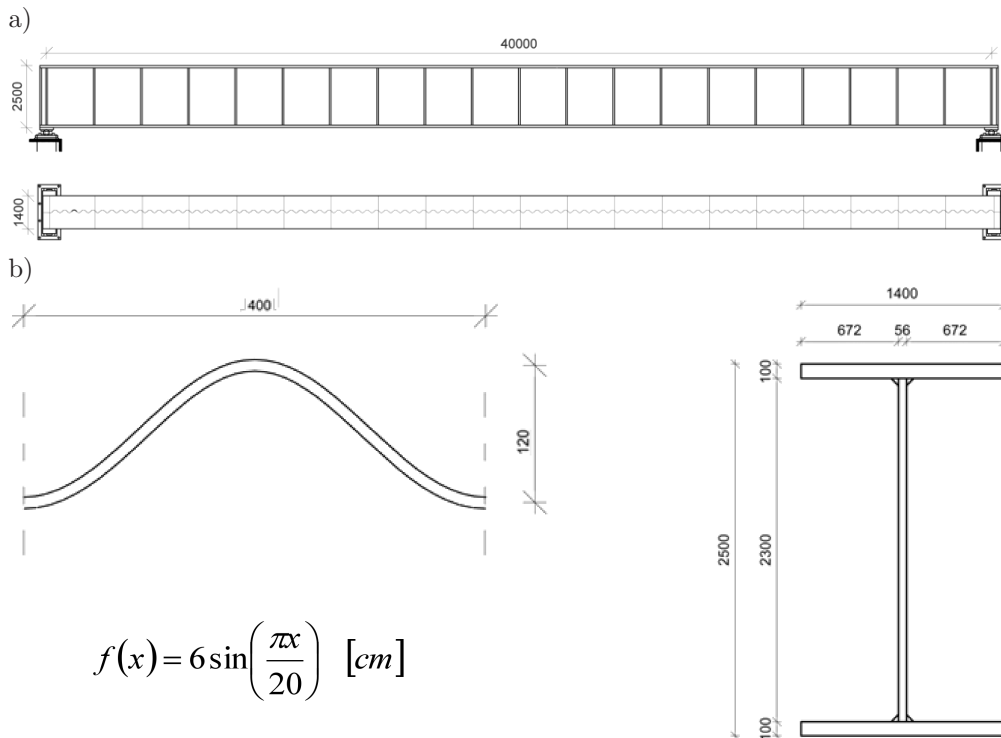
Geometry of the girder: a) layout, view and static scheme [mm],
